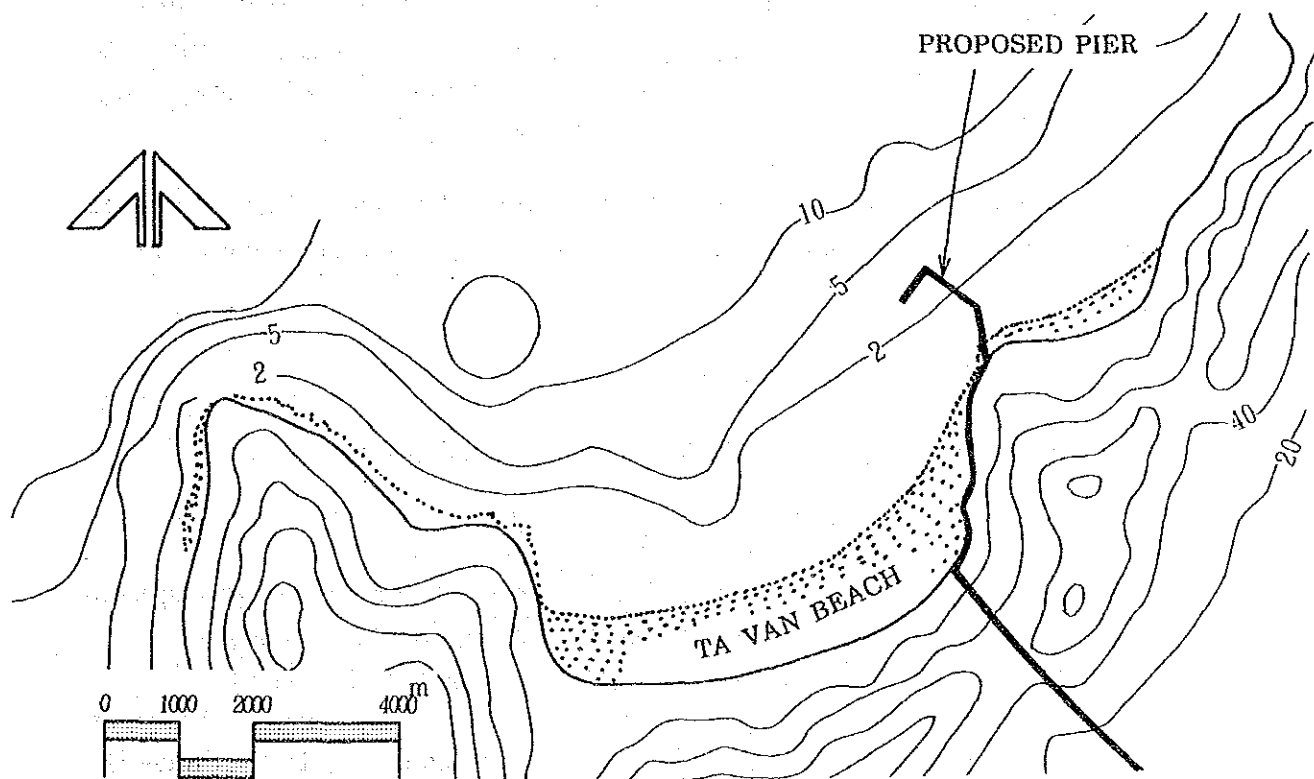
Location and Configuration of Ta Van Pier
